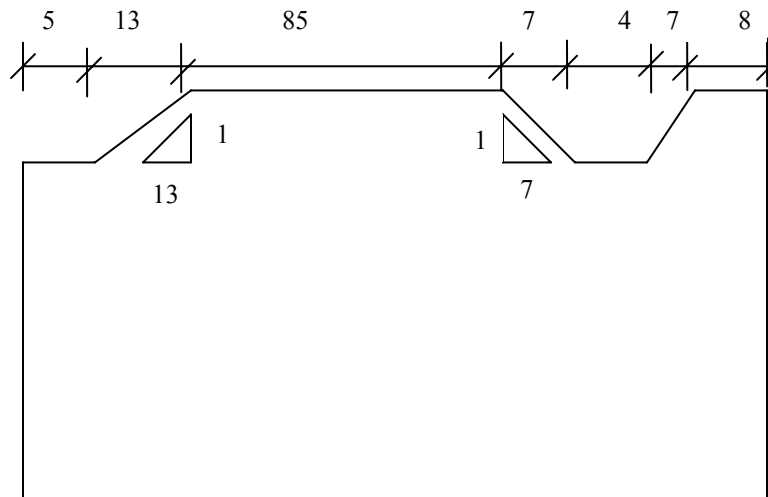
Fort Worth North Loop 820 Study Section B Pavement Cross Section Sketch.
